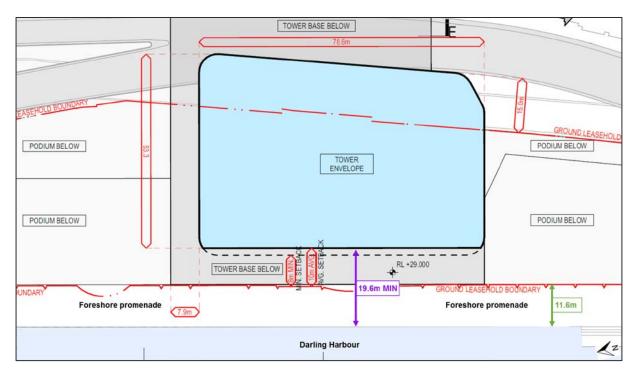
| Tower envelope minimum and average setback from the promenade (red) and minimum setback from Darling Harbour (purple) (Base source: Applicant's RtS)
